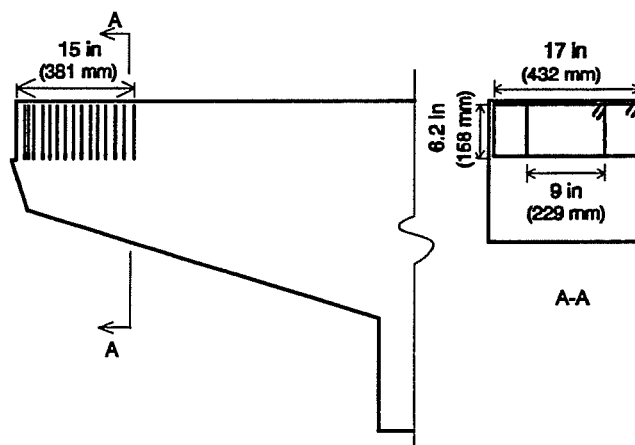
Detail of confinement reinforcement in bearing area of post-tensioning anchorage
